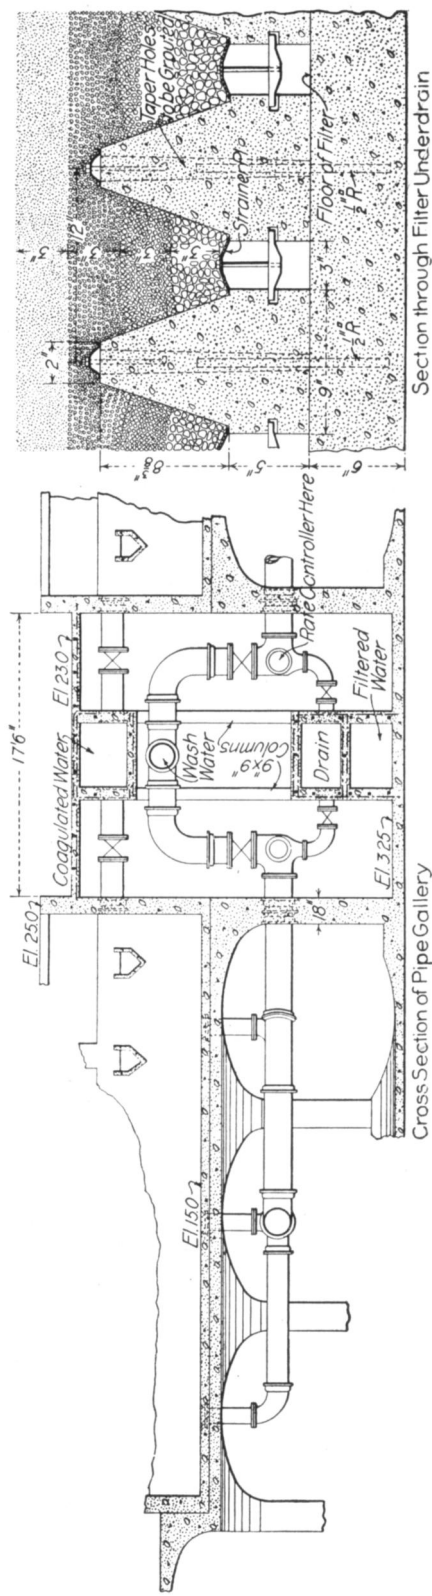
CROSS SECTION OF RESERVOIR, PIPE GALLERY AND UNDERDRAINS, EVANSTON FILTER PLANT
